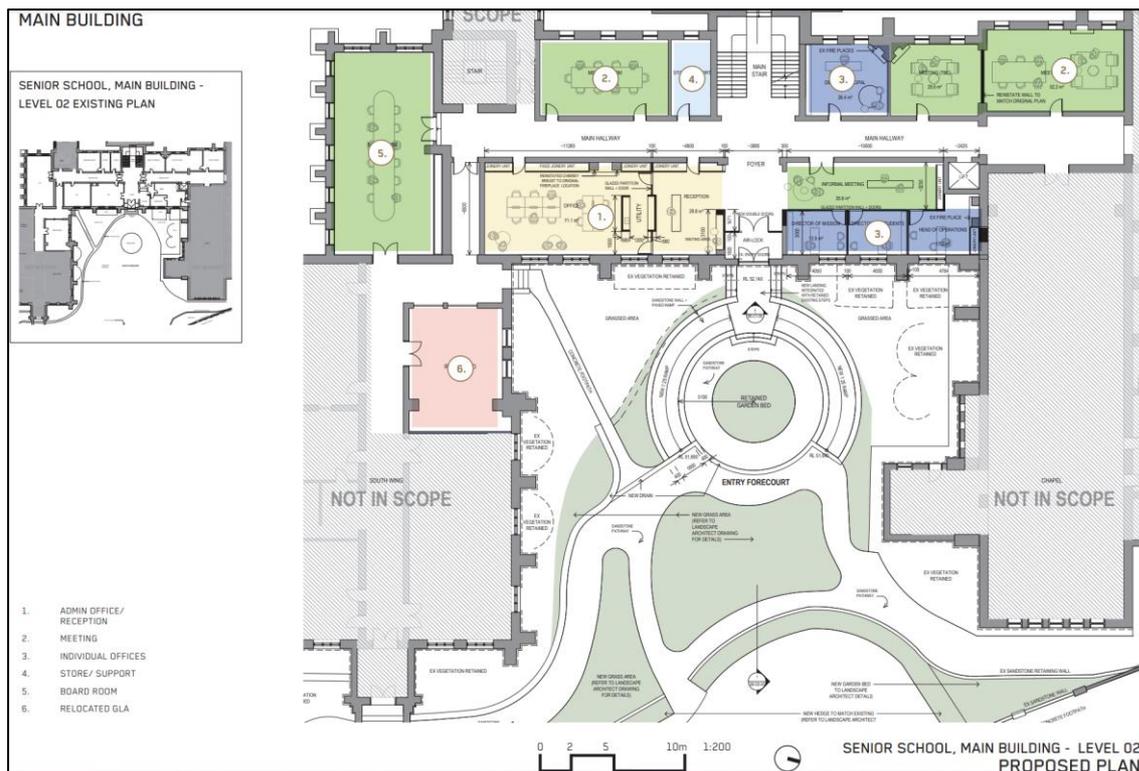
| Precinct B senior school entry (Source: Applicant's RtS 2021)
